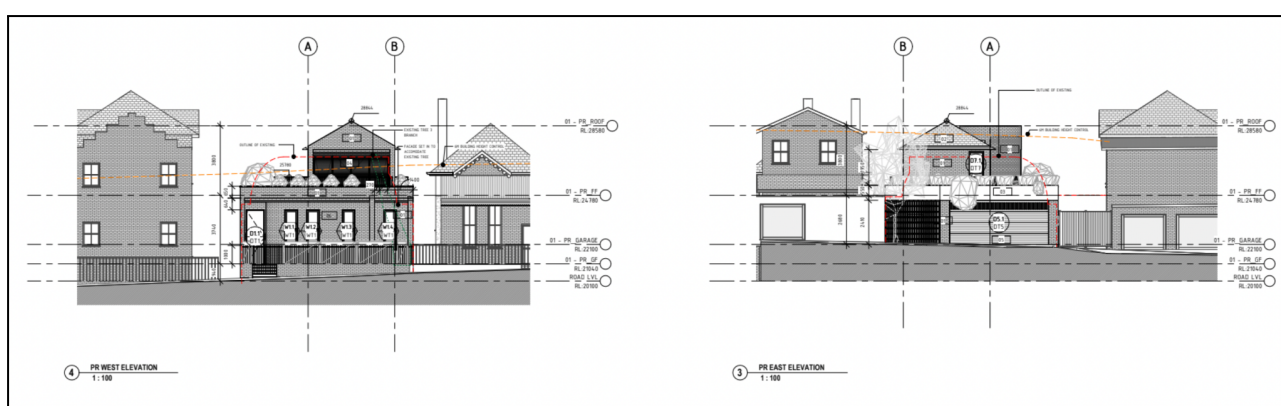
Demonstrating how the proposed form will sit with the immediately neighboring structures.
